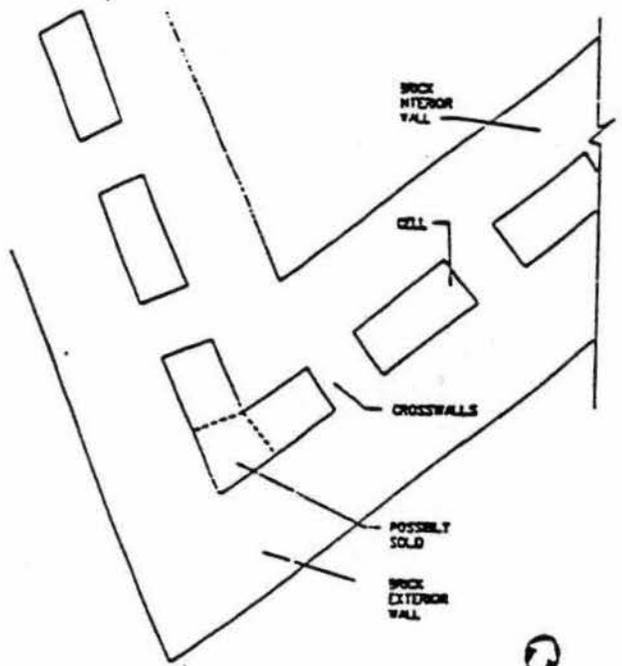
Plan diagram of scarp walls, counterforts, and crosswalls at the Ravein salient angle.
